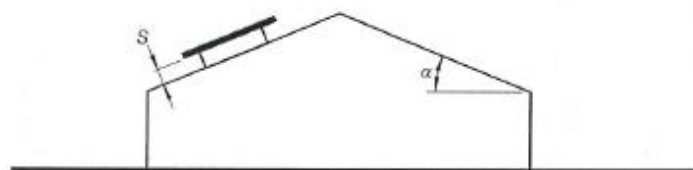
PANEL MOUNTED PARALLEL TO ROOF PLANE
